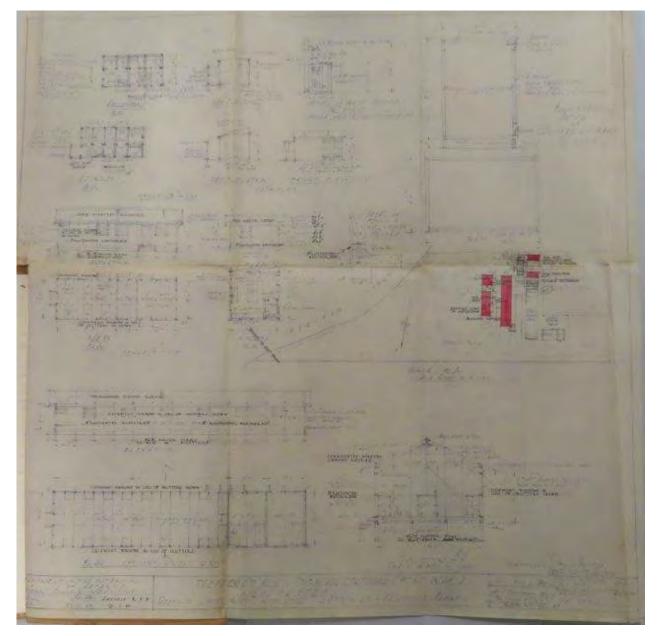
Plan showing buildings to be erected at Shepherds Hill. (Source: NAA, SP155/1, DEF22647E)
